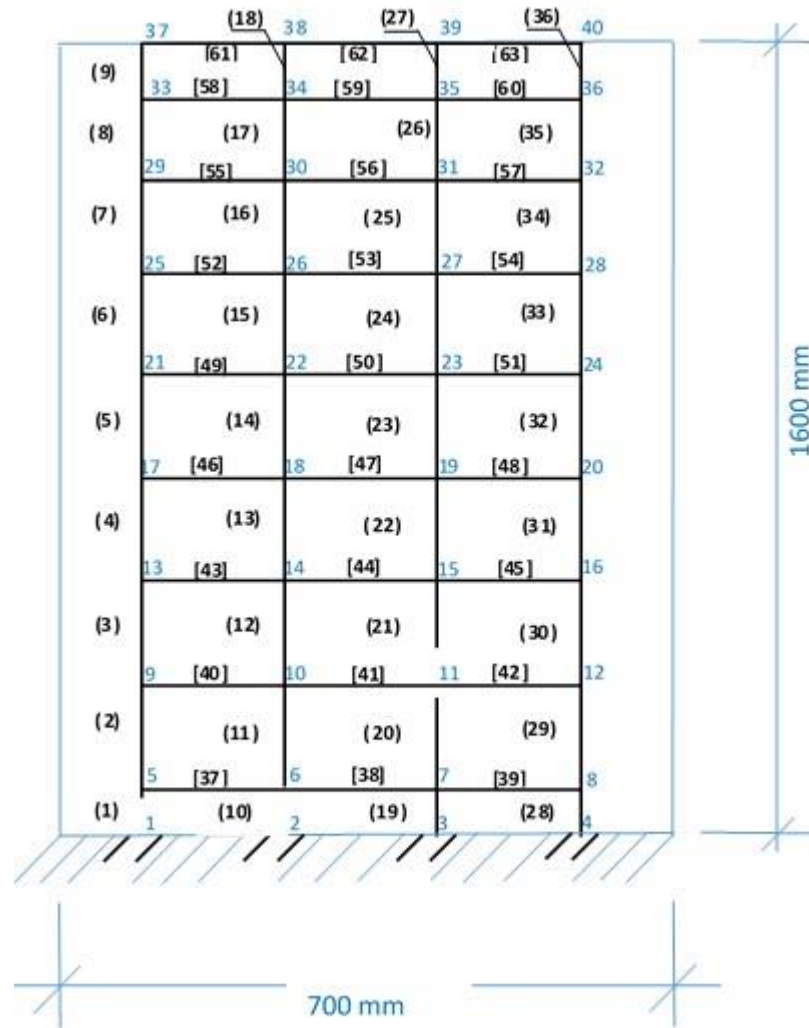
Schematic of the grillage model for wall W1 with joints and elements labelling.
